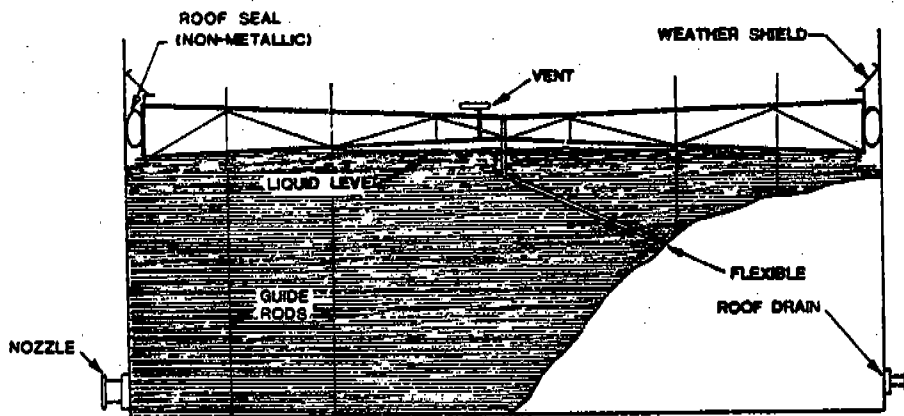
Double deck floating roof storage tank (non-metallic seals).
